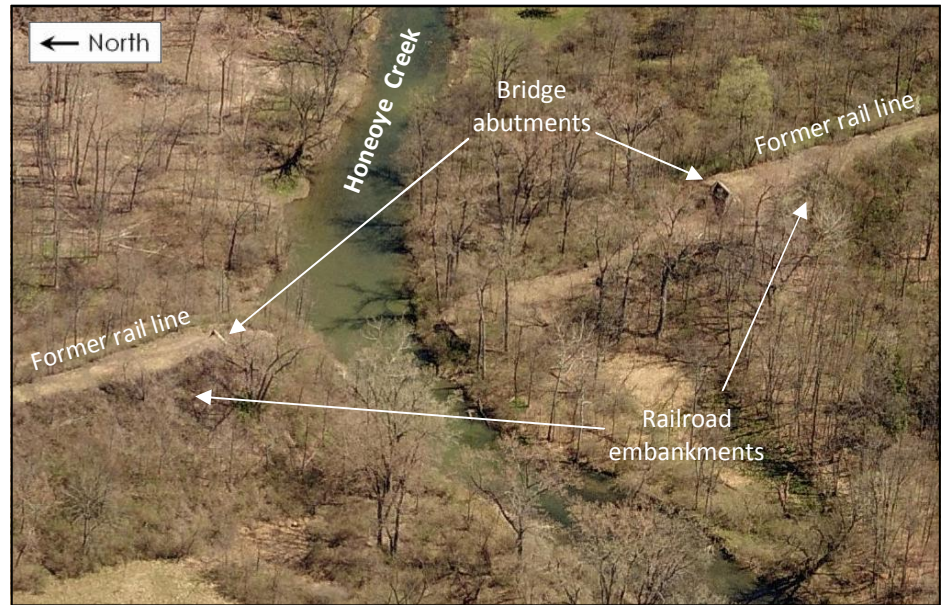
Site of former Lehigh Valley Railroad crossing over Honeoye Creek
